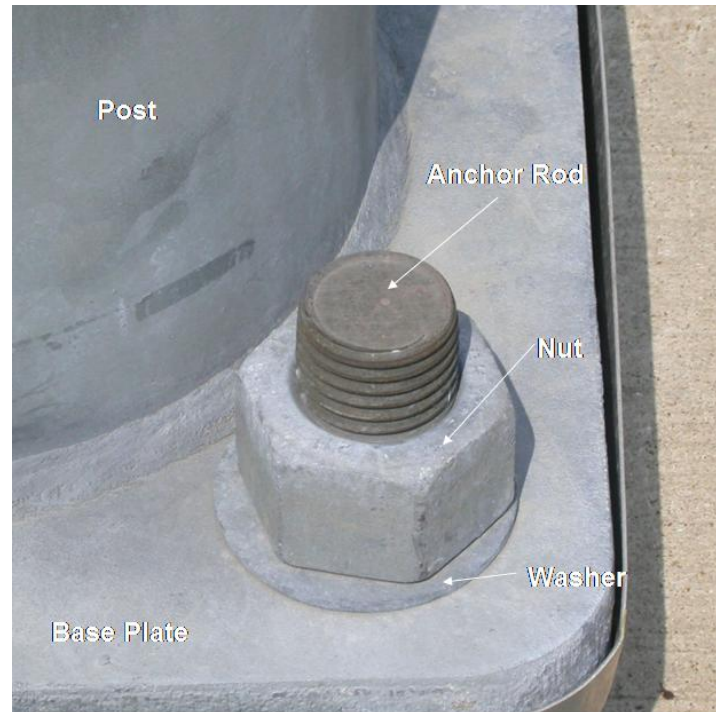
Anchor rods detail of a monotube sign structure.
